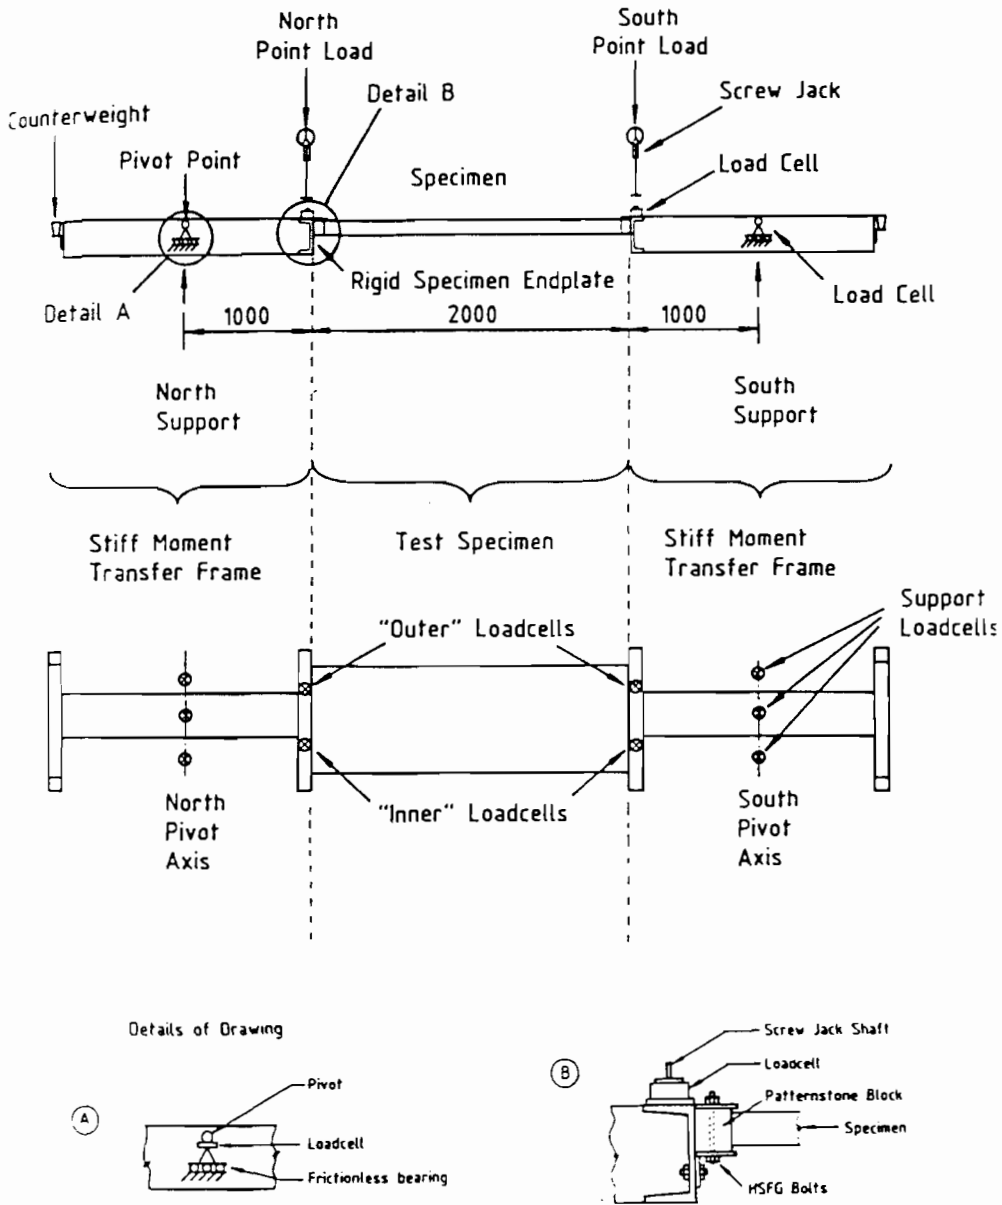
Test Rig, Elevation and Plan of Test Setup [Bernard et al. (1992a)(1992b)]
